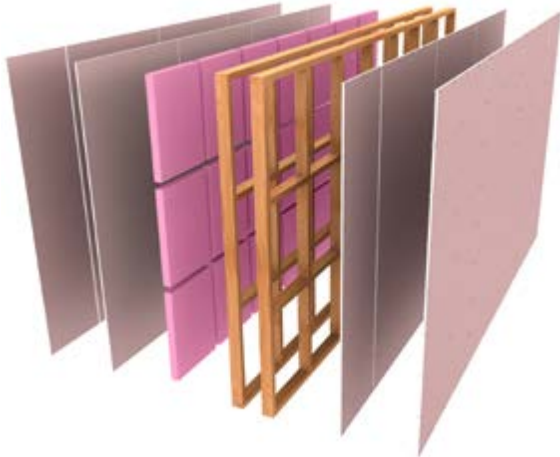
Double timber frame IT wall system, heavy unit linings, penetrations sealed
